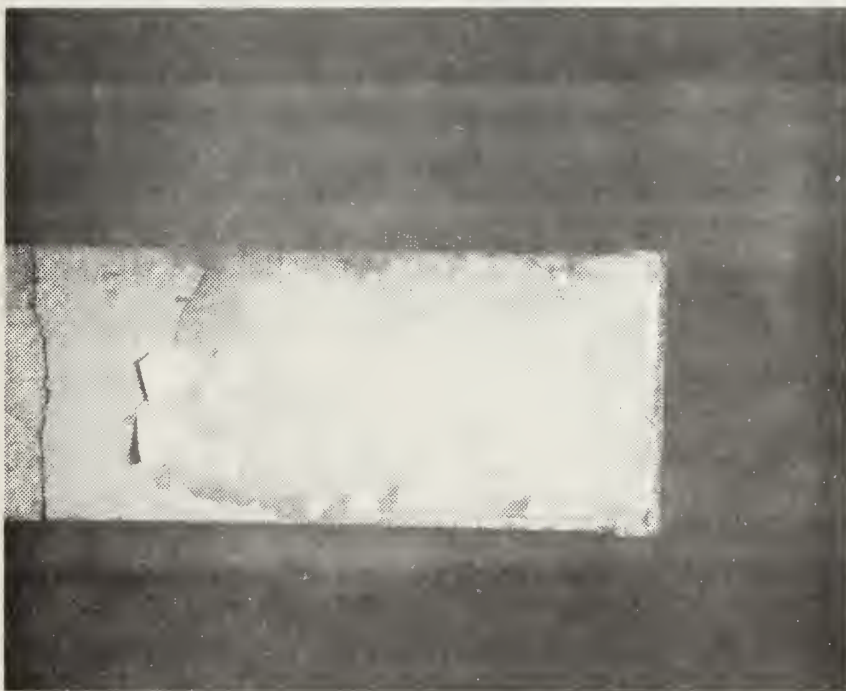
TENSILE SPECIMEN SHOWING EPOXY/PAPER COATING AND TENSILE FAILURE CRACK
